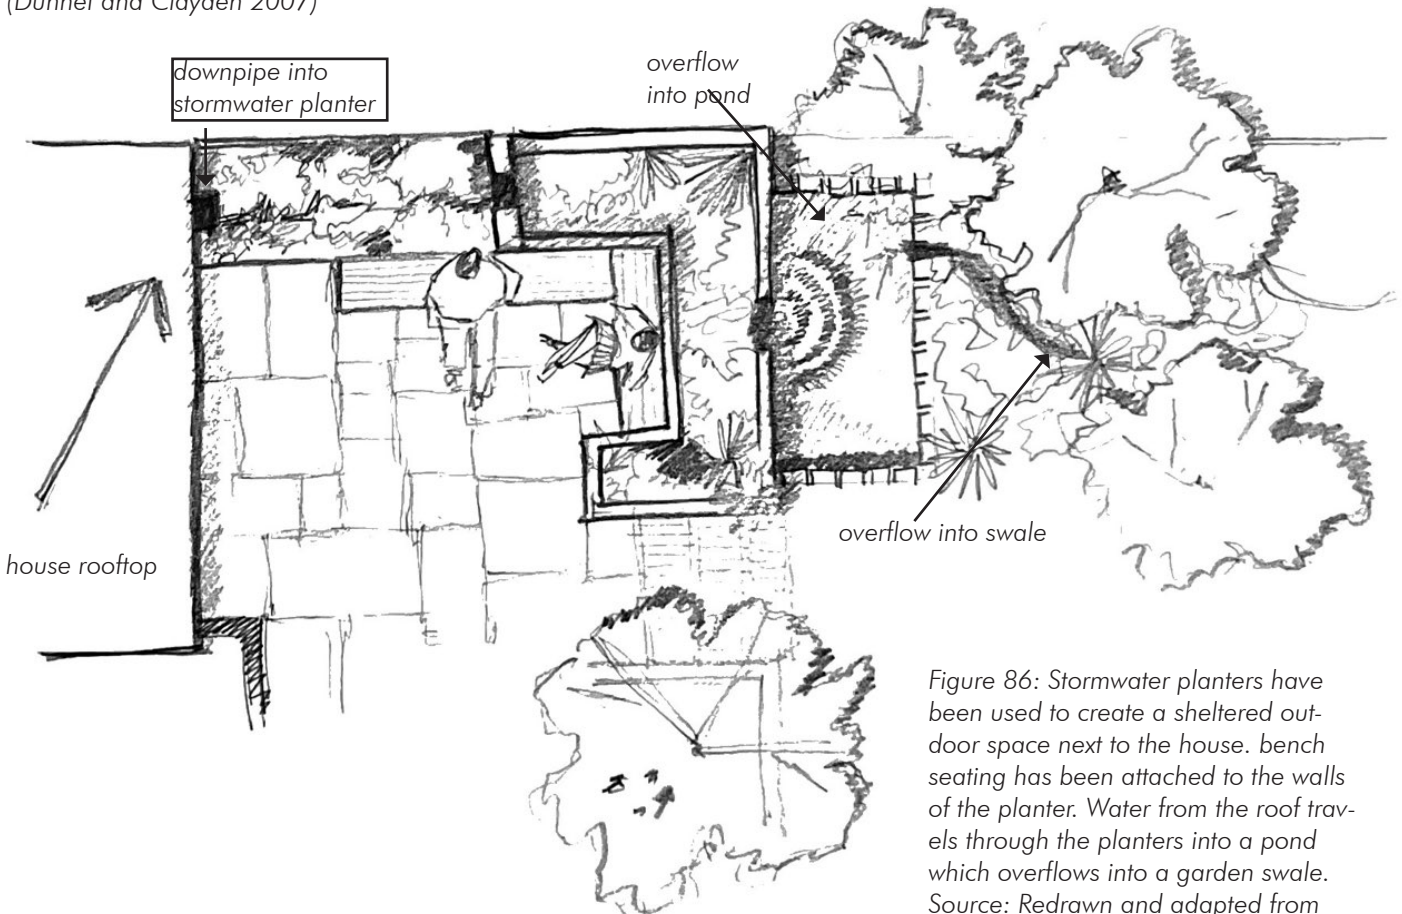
Stormwater planters have been used to create a sheltered outdoor space next to the house. bench seating has been attached to the walls of the planter. Water from the roof travels through the planters into a pond which overflows into a garden swale.
